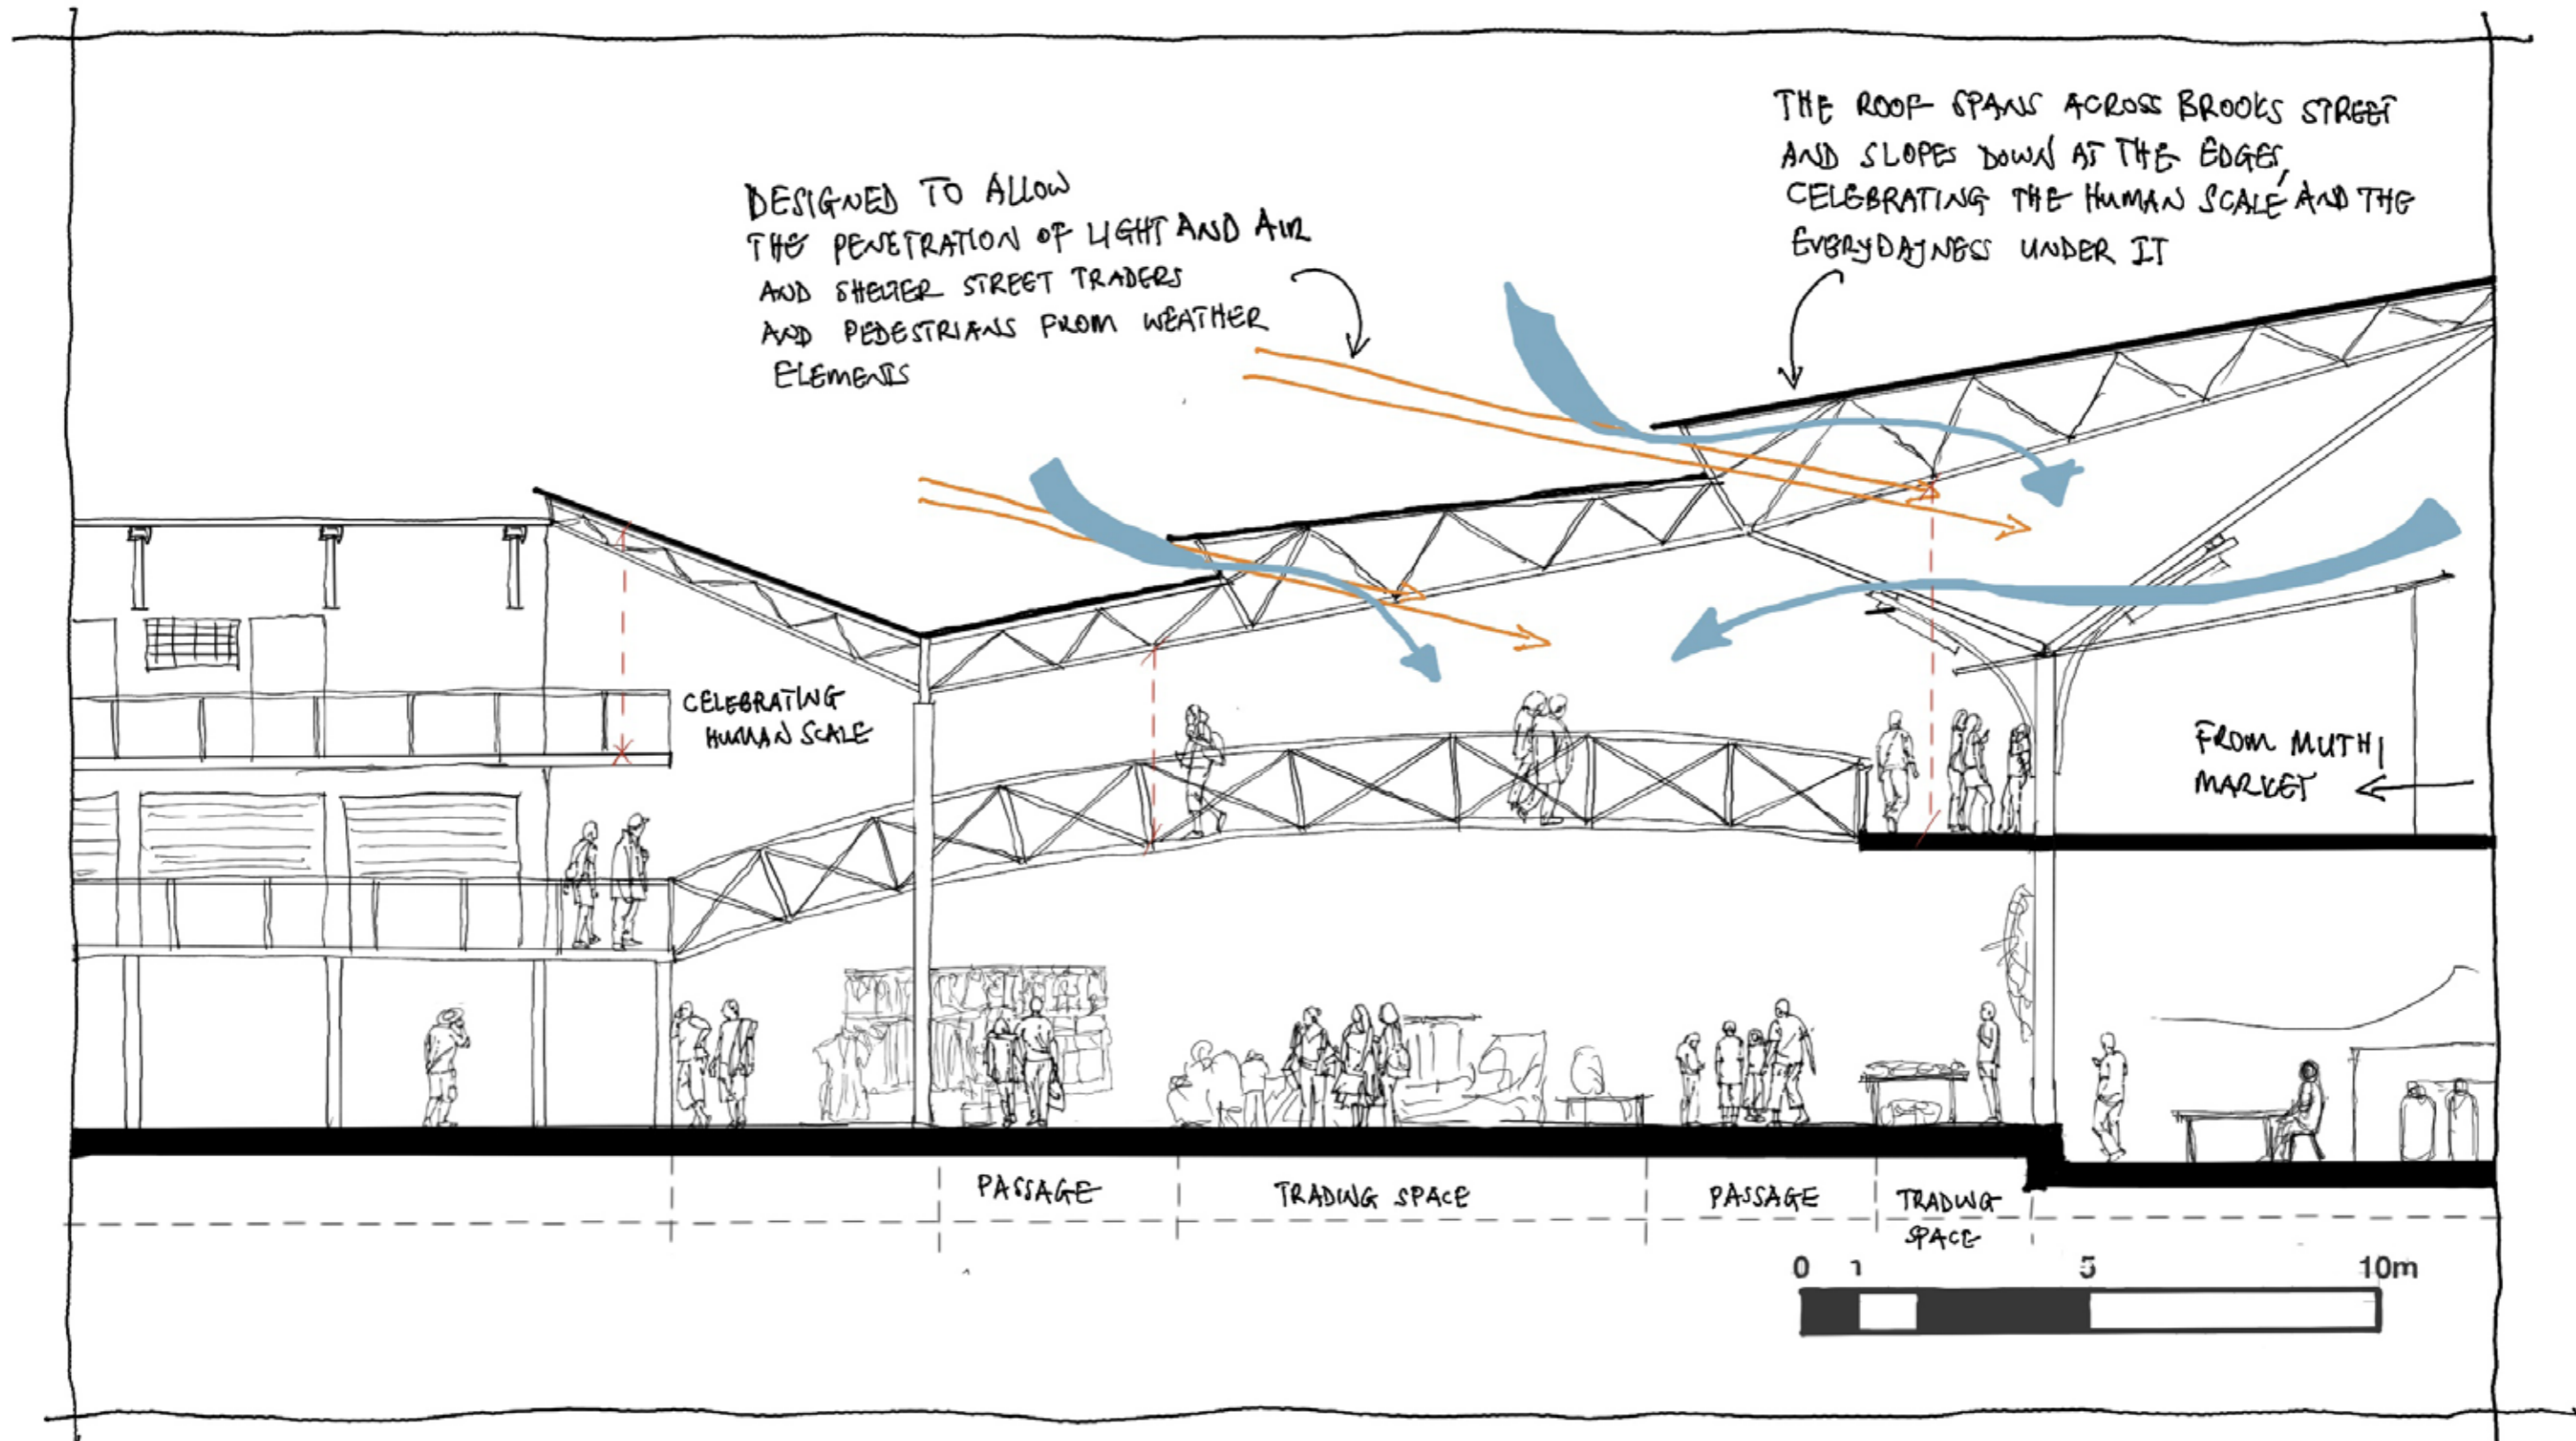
Section through Brook Street market. Illustrated by Author (2023).
